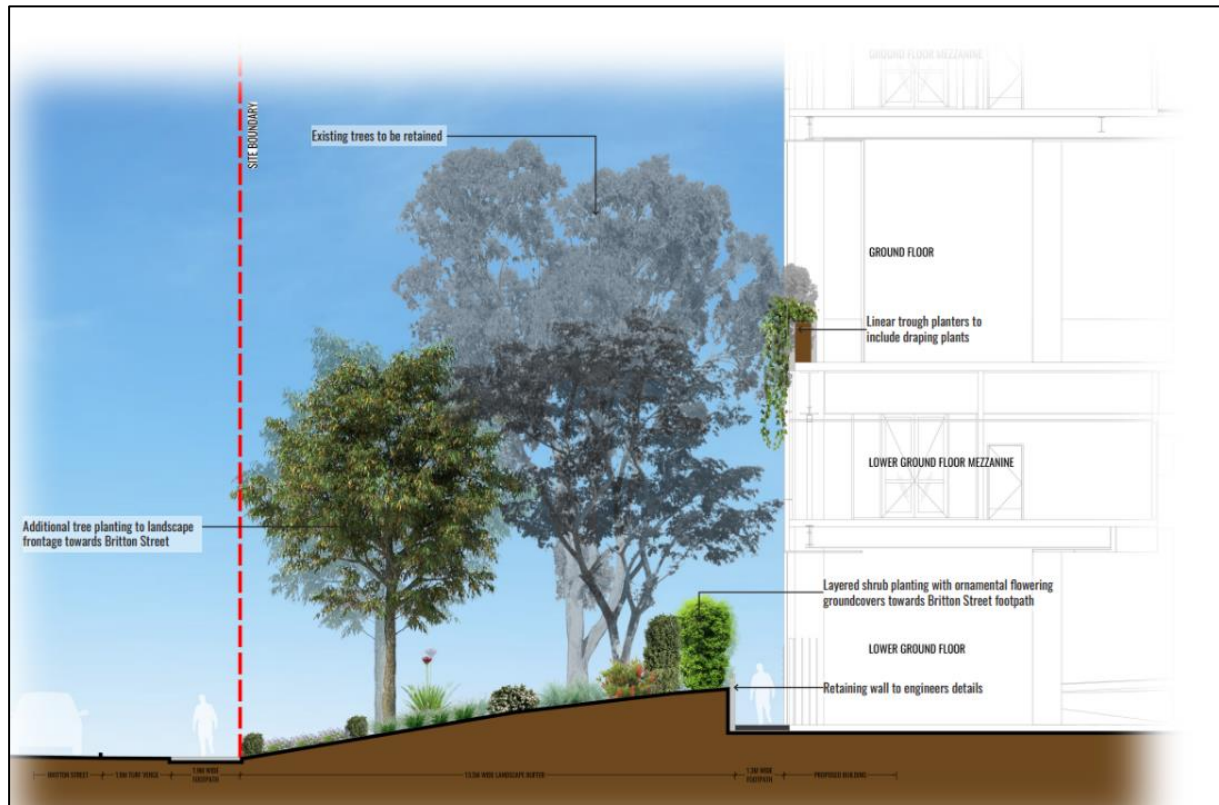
Britton Street Section (Source: Geoscapes, 2024)
